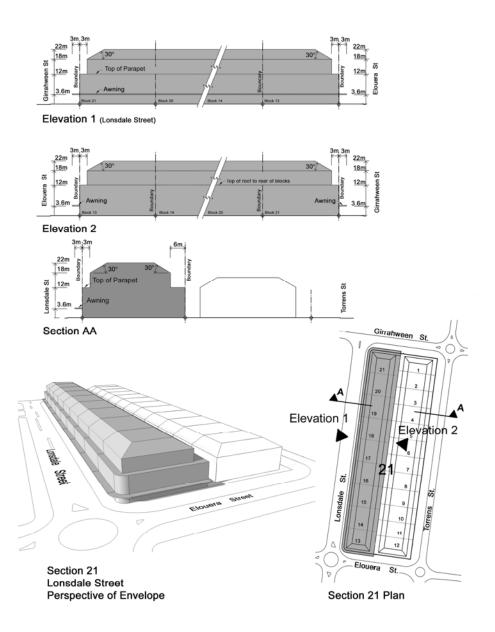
Building Envelope Diagram - Braddon section 21 blocks 13 – 21
